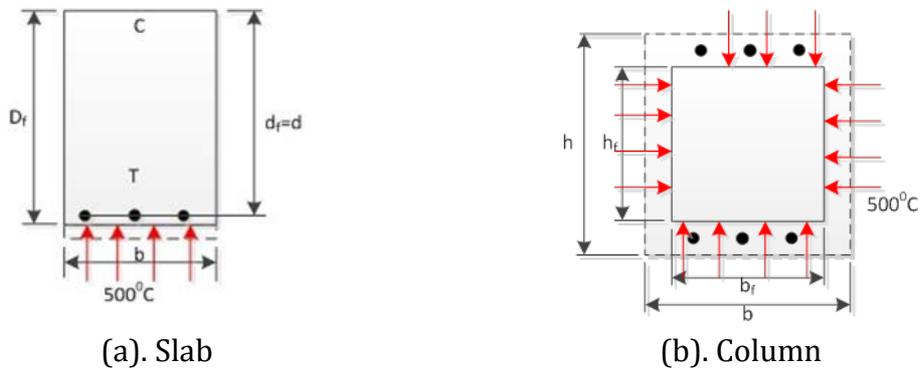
REDUCED CROSS SECTION OF REINFORCED CONCRETE MEMBERS
